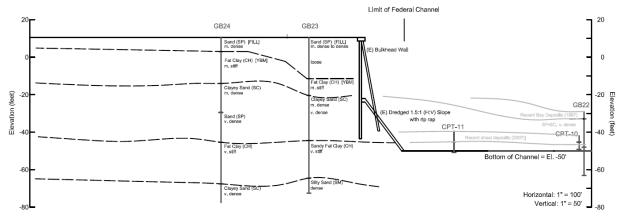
Alameda/Fisk Property Cross-Section D-D'(Existing)
